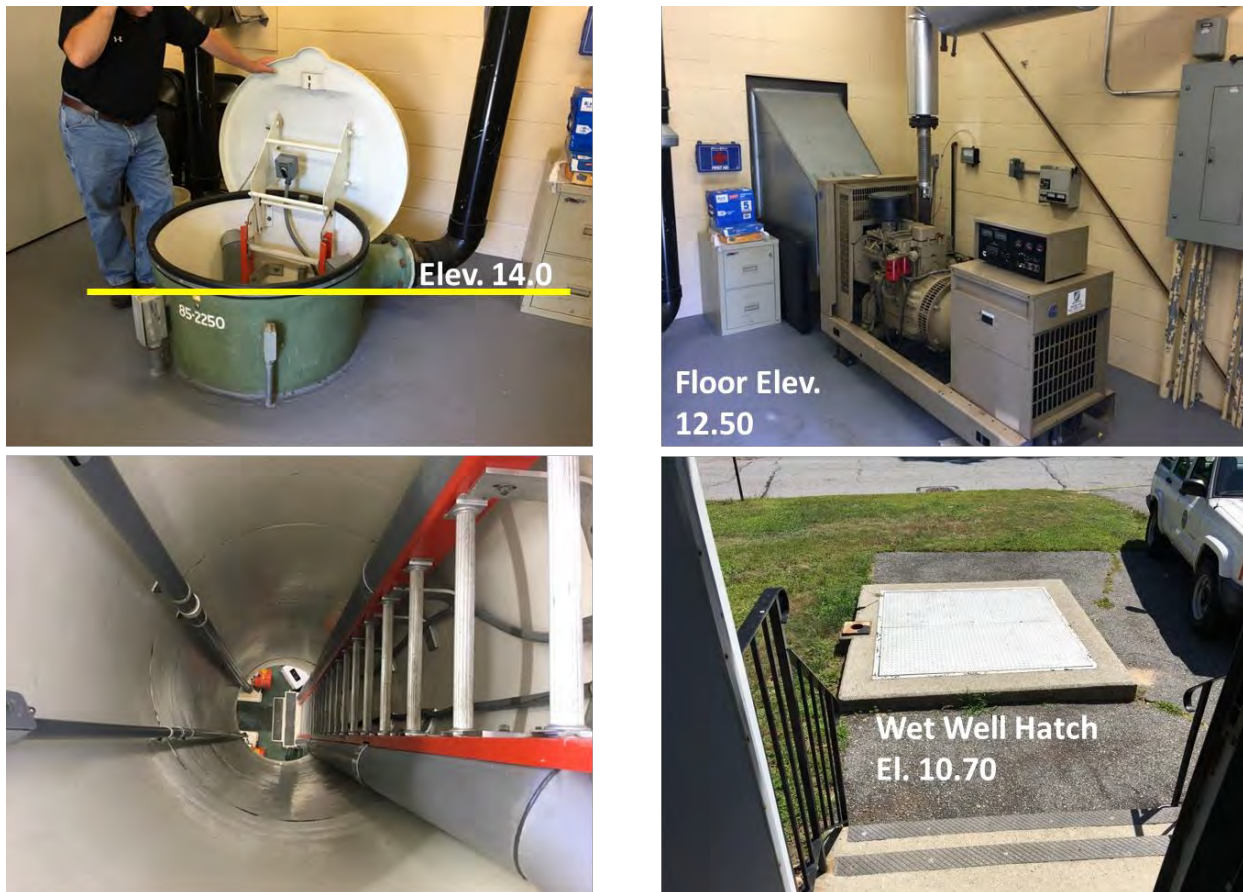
Photos of Gardiners Wood Wastewater Pump Station
